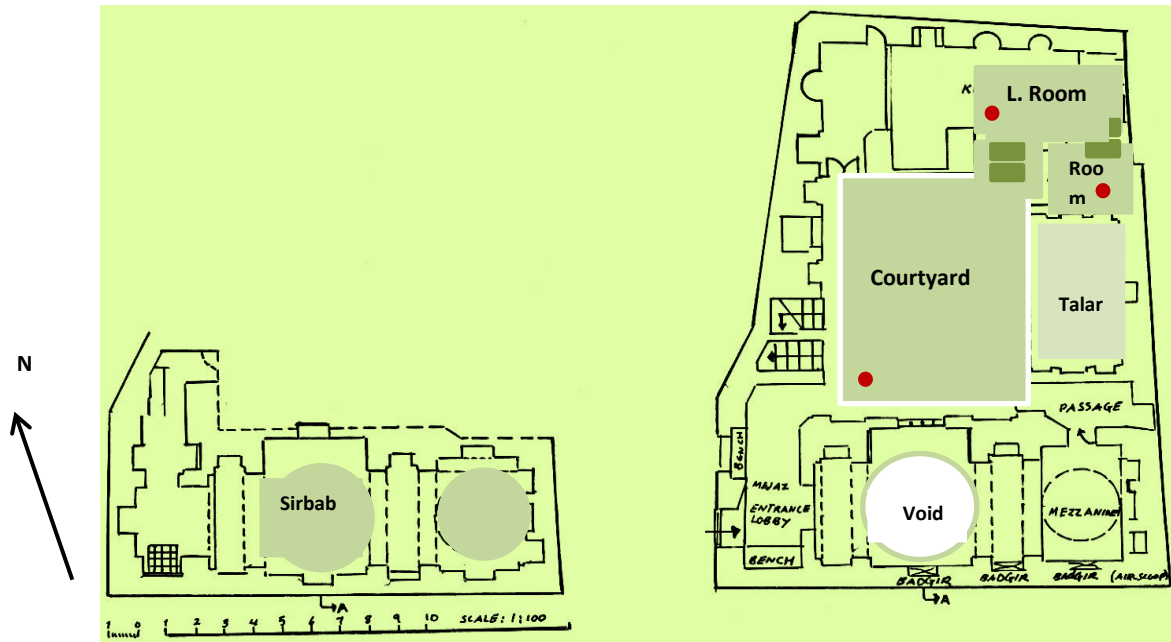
Basement level (Sirdab) plan and ground floor level plan (Researcher) Scale: 1:50
